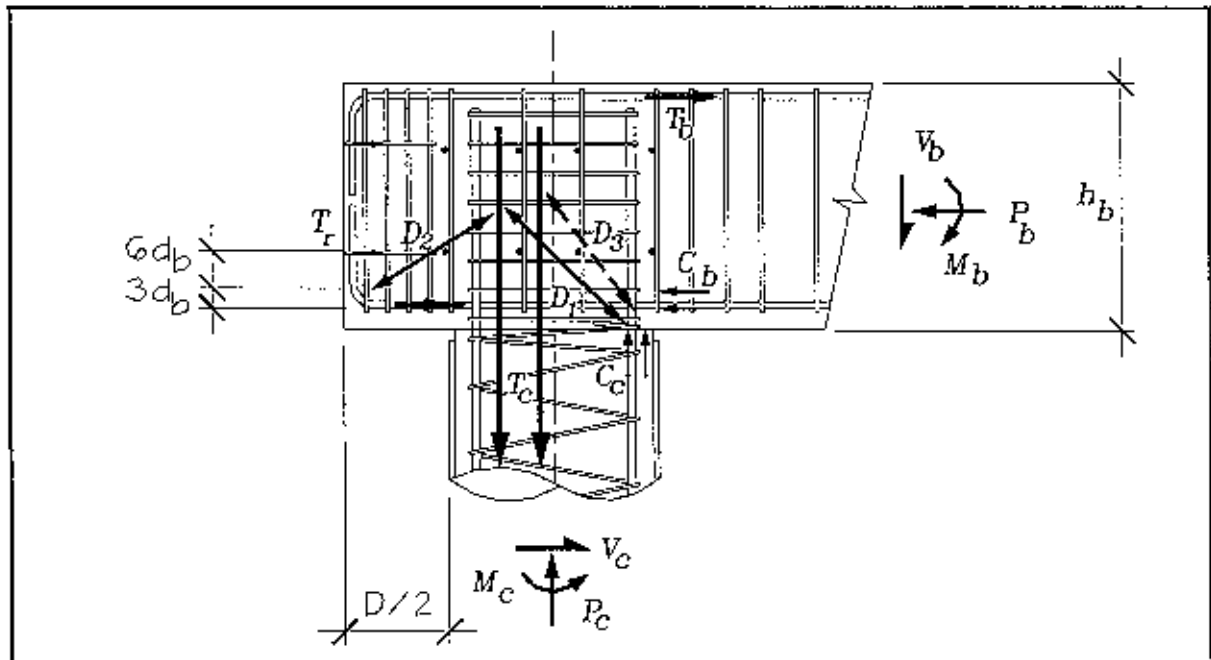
Forces Acting Upon a Bridge Knee Joint and its Idealized Joint Strut
